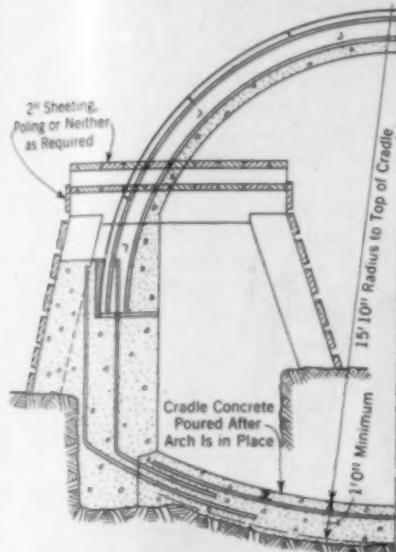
HALF SECTION THROUGH TUNNEL EXCAVATED IN SOFT GROUND
